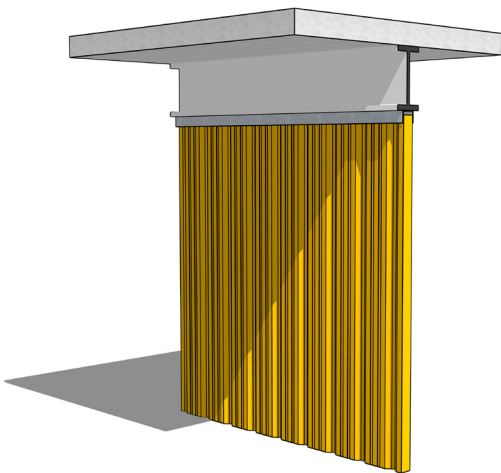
Closed/open steel beam sections to Korok wall with deflection head.
